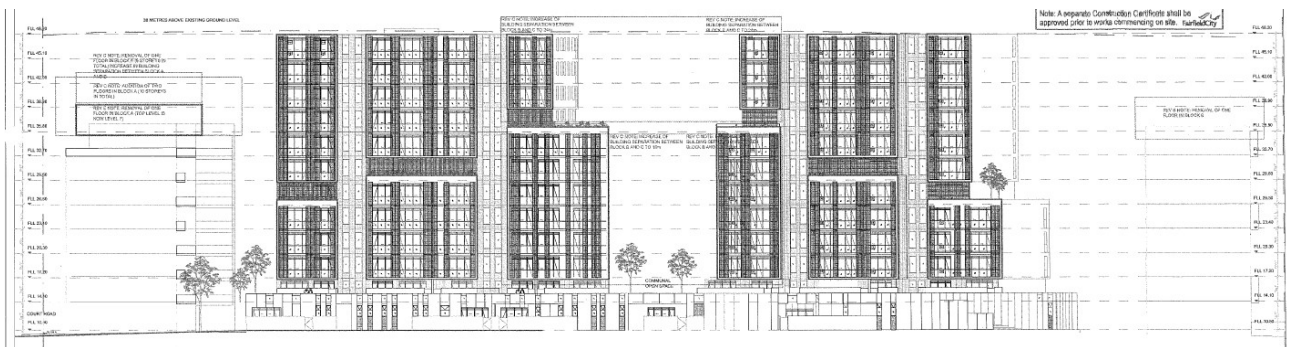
Approved north elevation of development facing the adjoining mixed-use development containing residential towers and McDonald's.
